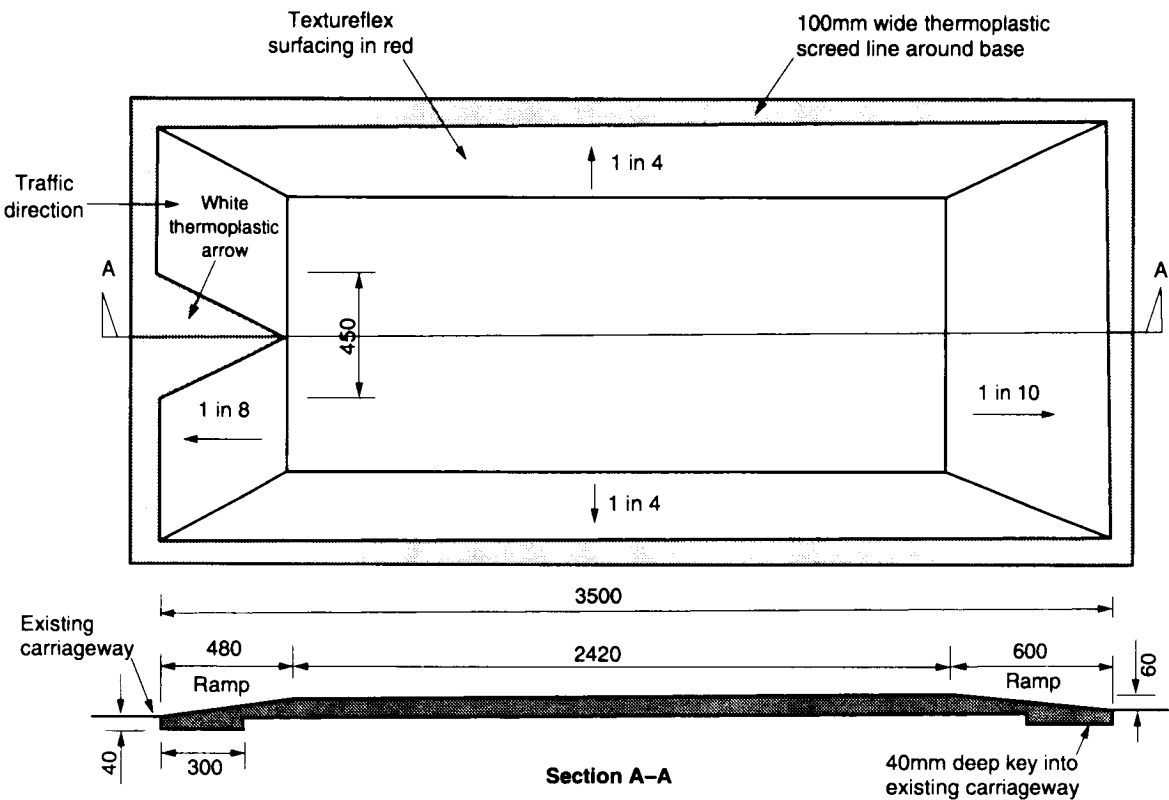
Detail of speed cushion installed in Craven Arms (all dimensions in mm)
